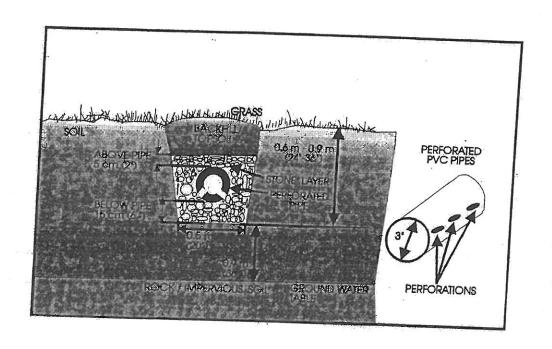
CROSS SECTION VIEW OF A LEACHING BED TRENCH
